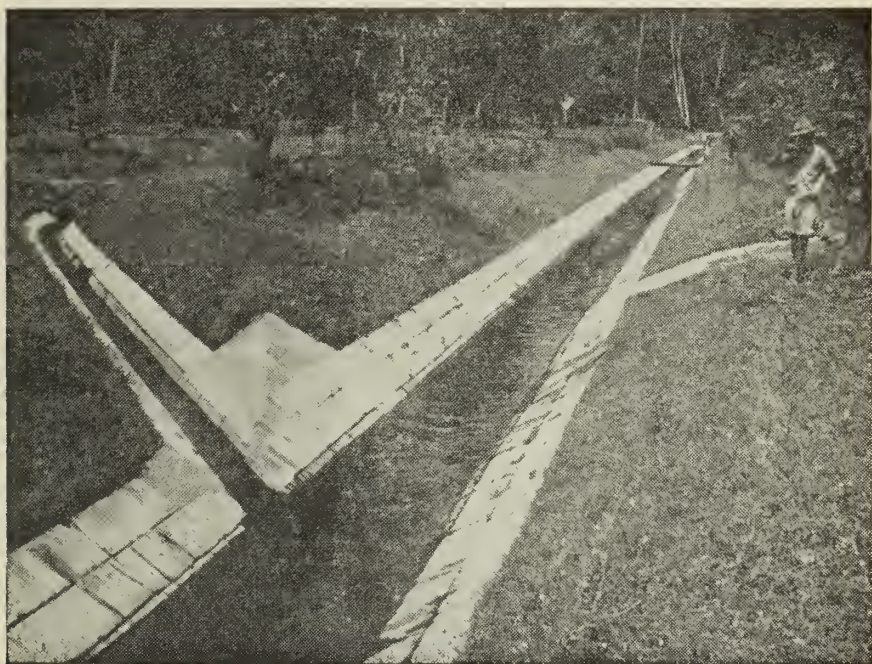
A Concrete Drainage Ditch at San Miguel, El Salvador
